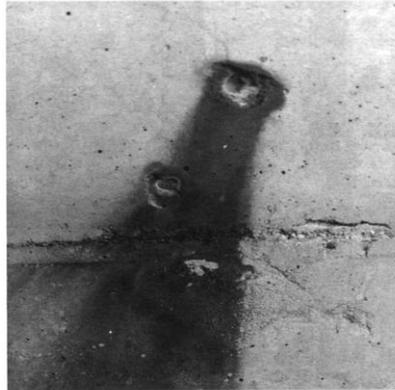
Detail of the stained bridge pier concrete pop up (Ceukelaire, 1991).
